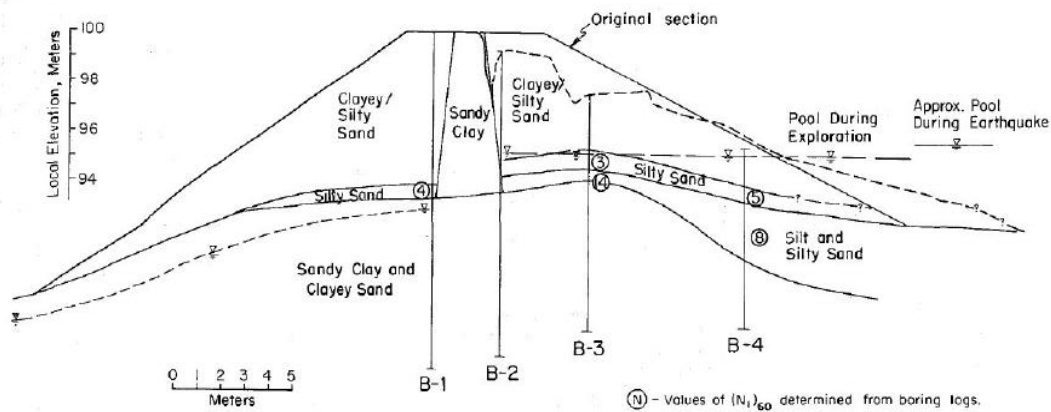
Soil stratigraphy and pre-failure and post-failure cross-sections of the La Palma Dam (Alba et al., 1987)
